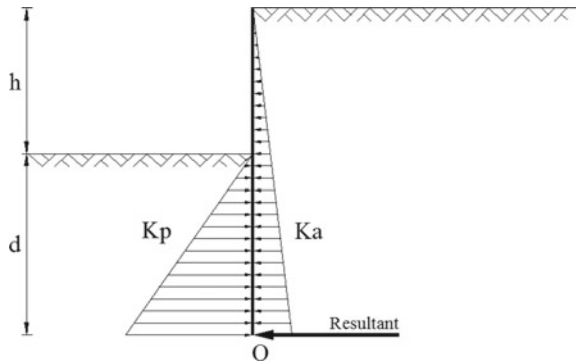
Conventional design method of cantilever sheet pill wall in granular soils
